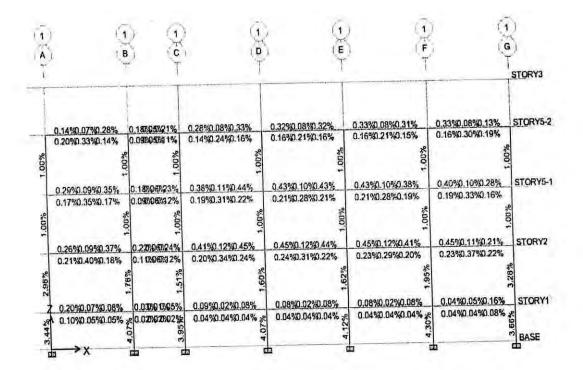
Required rebar percentage of frame members of an LGED-2 type cyclone shelter
